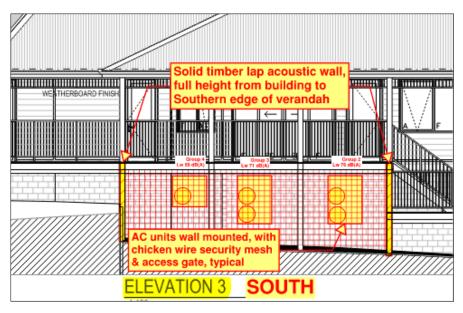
AIR CONDITIONING - GENERAL ARRANGEMENT SOUTH
